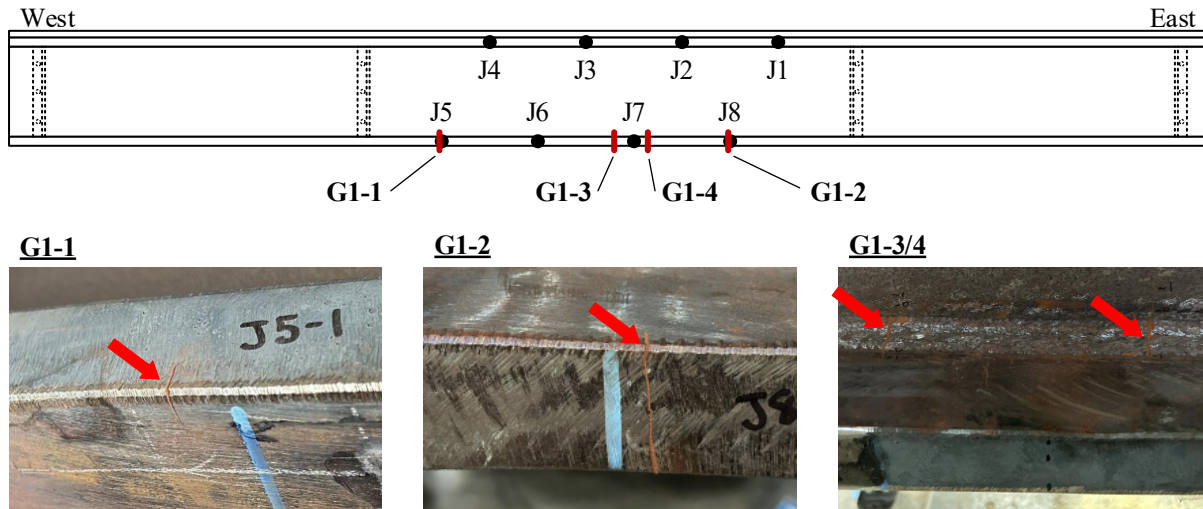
Illustration. Instrumentation layout for Girder 1 - Flange 1 (looking north).
